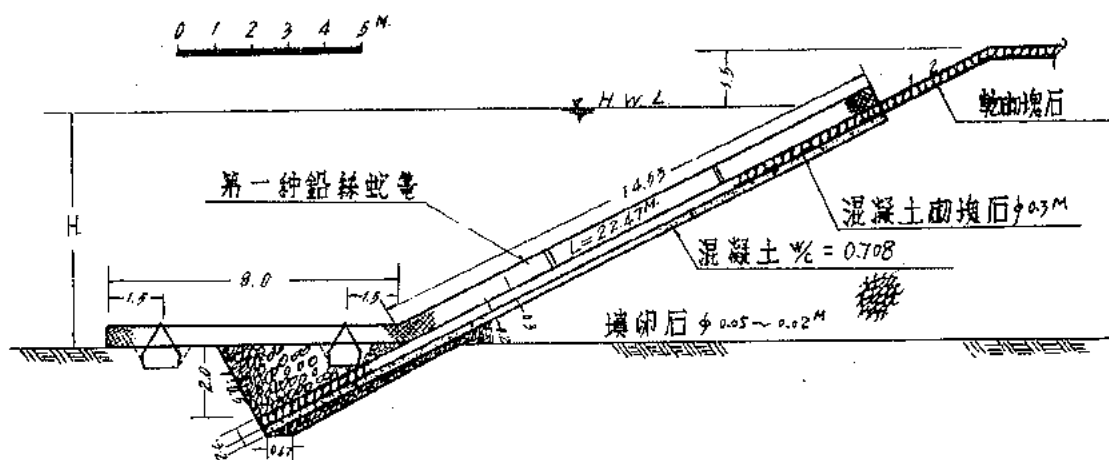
TYPICAL SECTION OF BRICK PAVING FOR LOW WATER CHANNEL.
